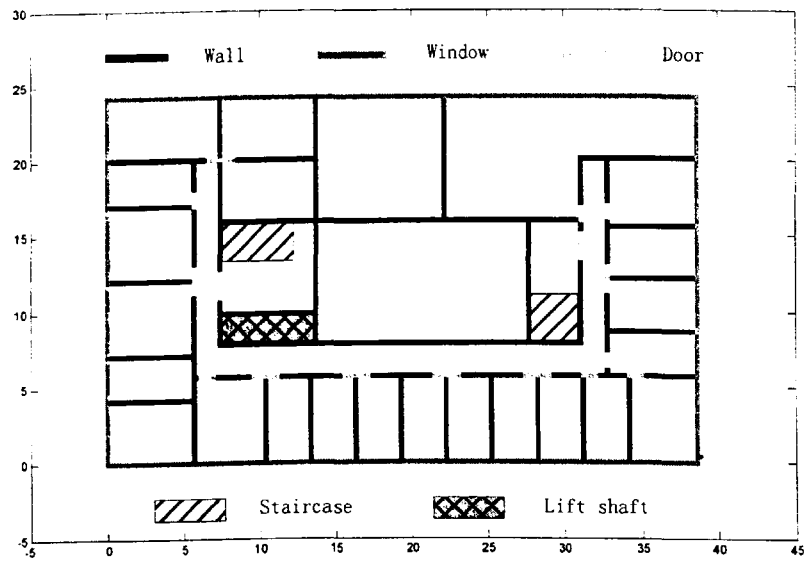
Blueprint of the sixth floor of the Electrical Engineering Building.
